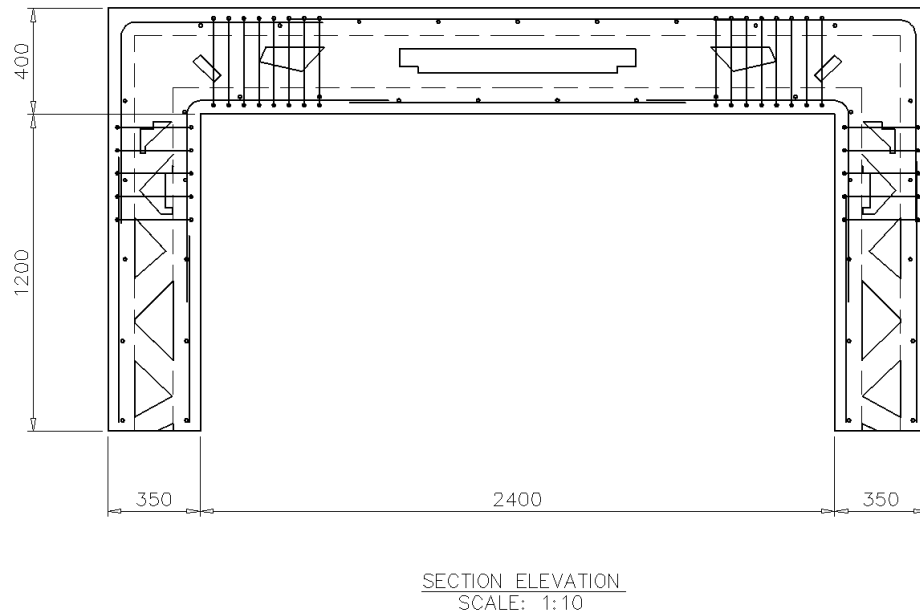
Optimised 2412 RCBC with trimmed voids and reinforcement
